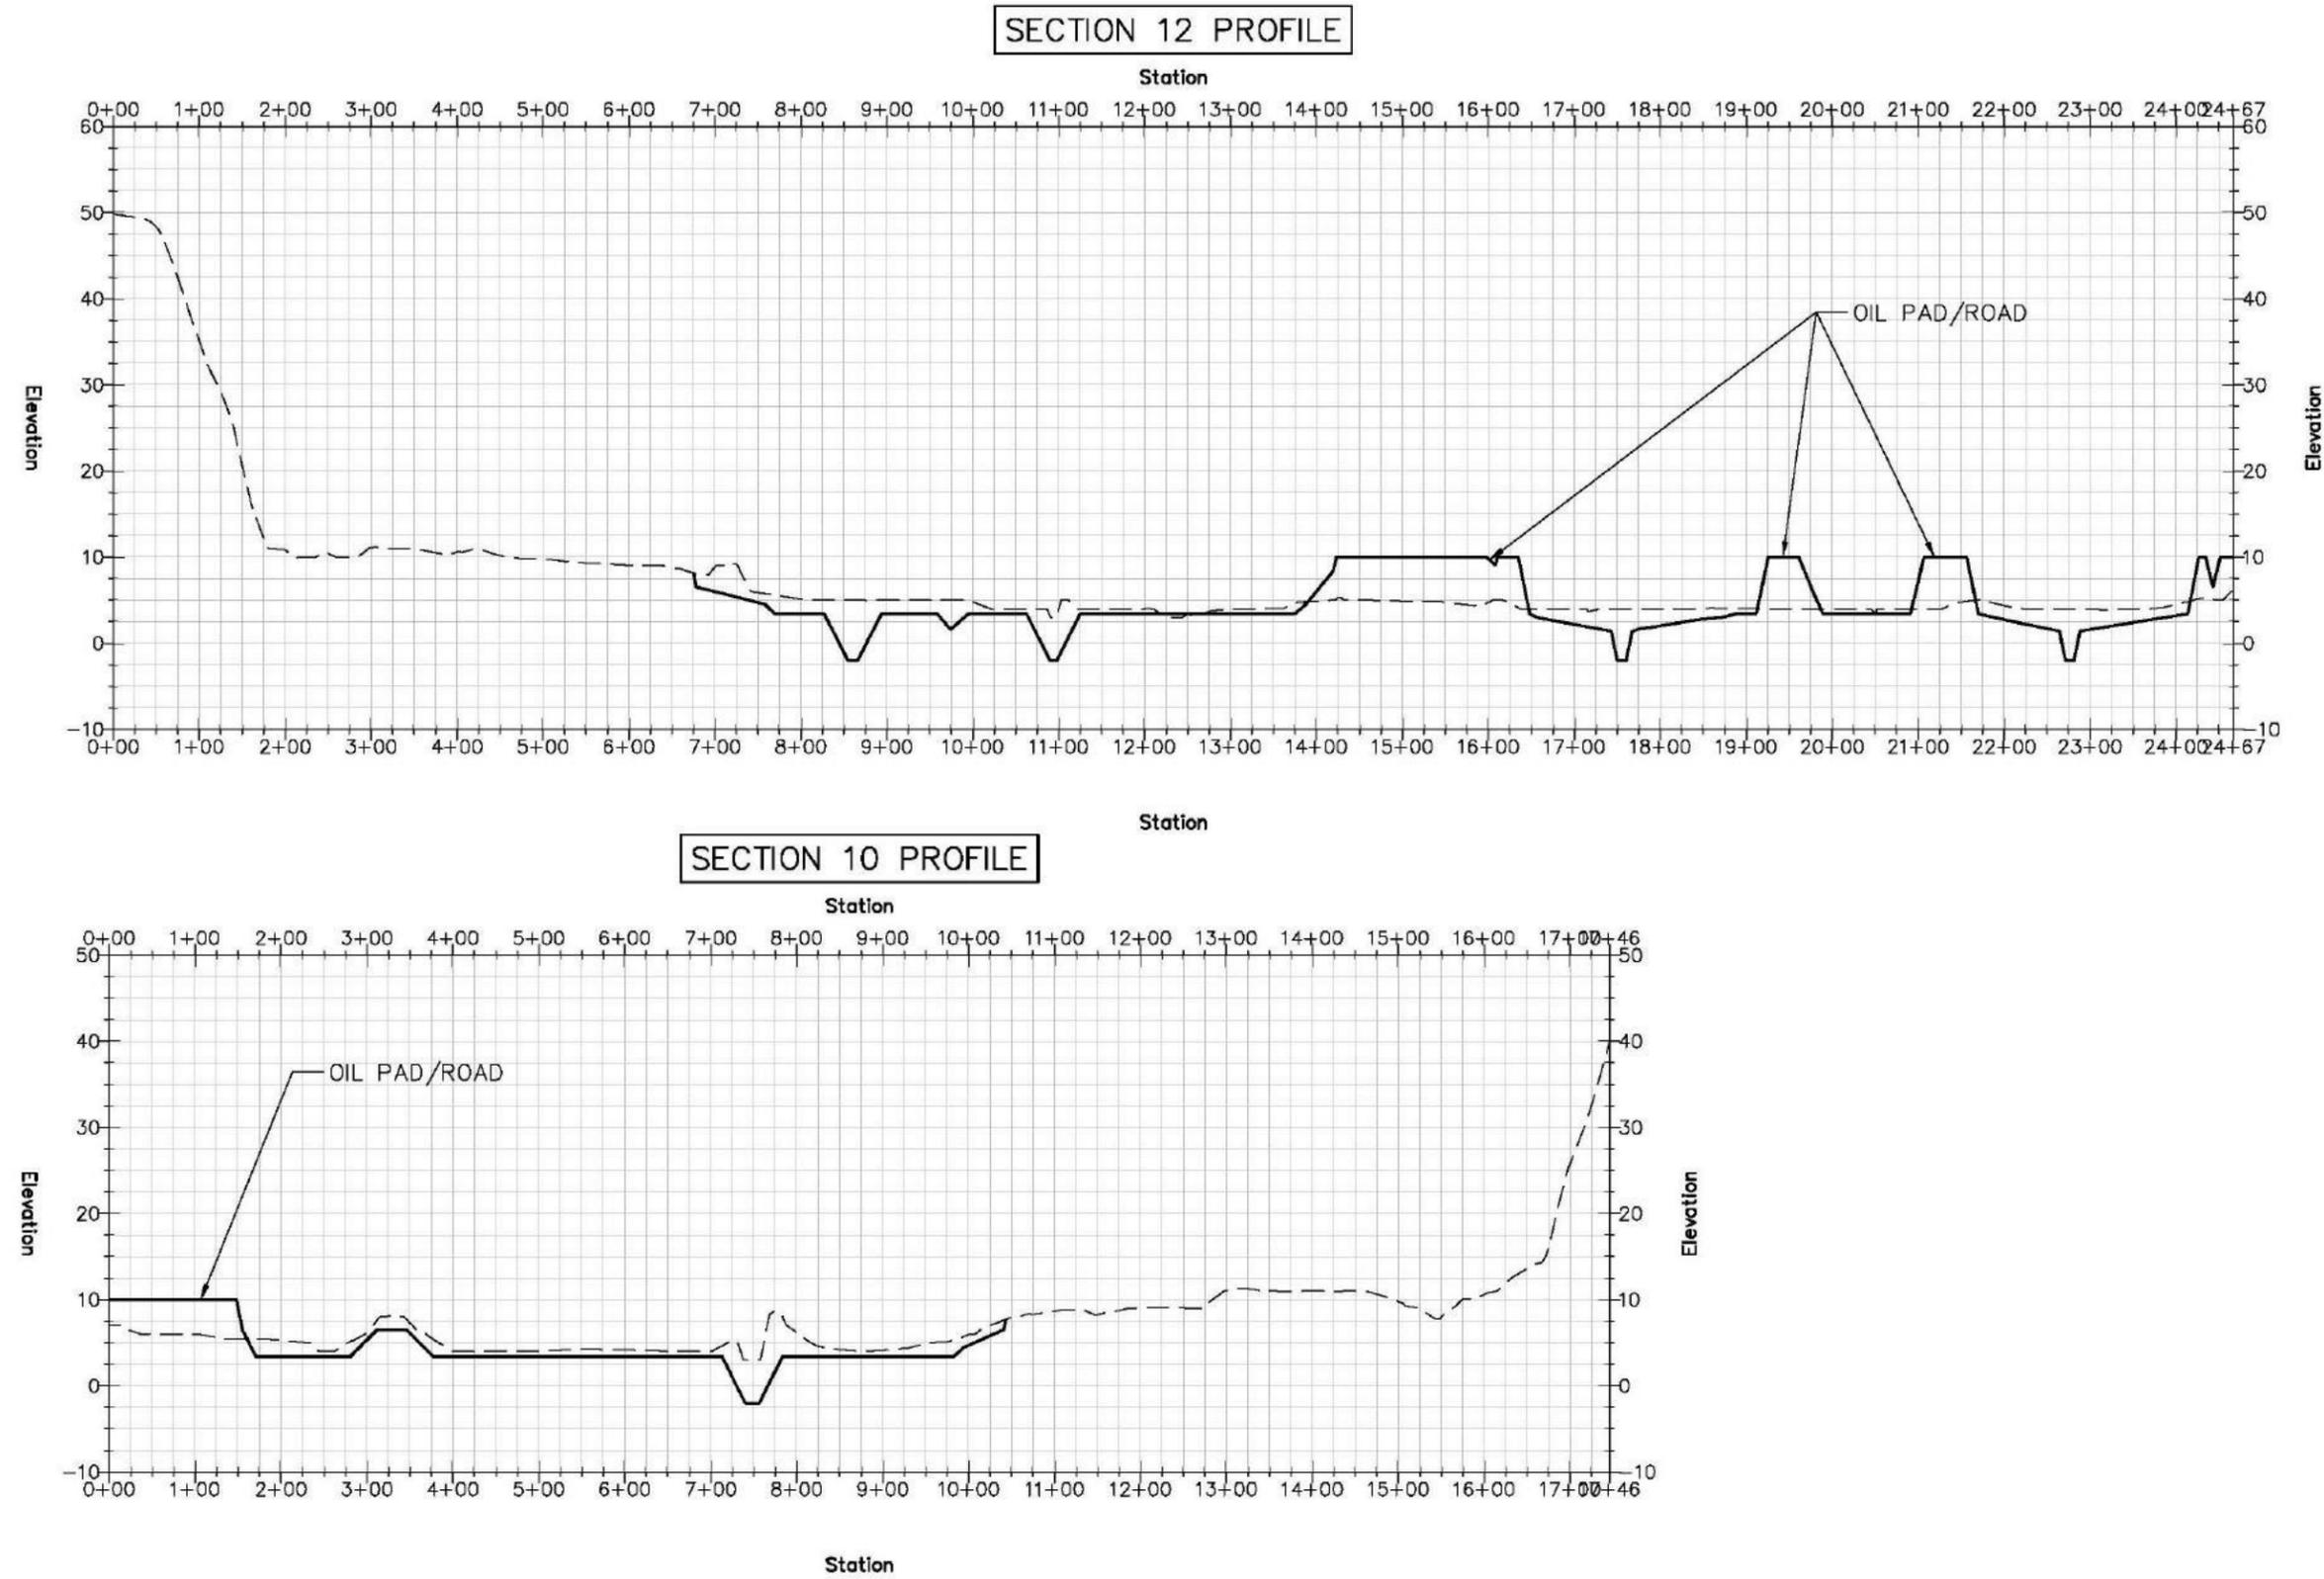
Conceptual Grading Cross-Sections, Minimum Alteration, Southeast Area
